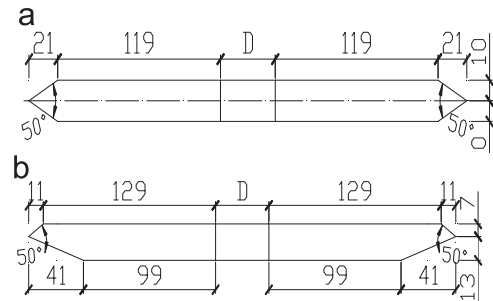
Sectional model diagrams of static wind loads measurement with working sections (unit:mm): (a) SY section, and (b) AS section.
